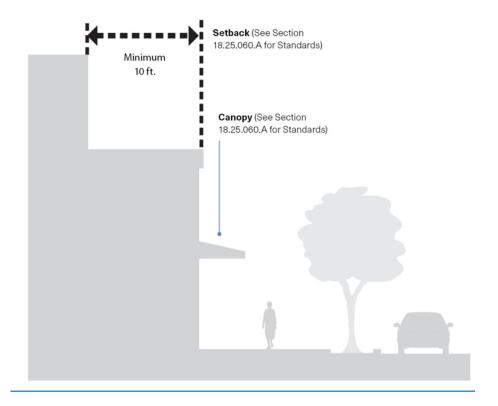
X8 BUILDING STEP BACKS AND CANOPY
